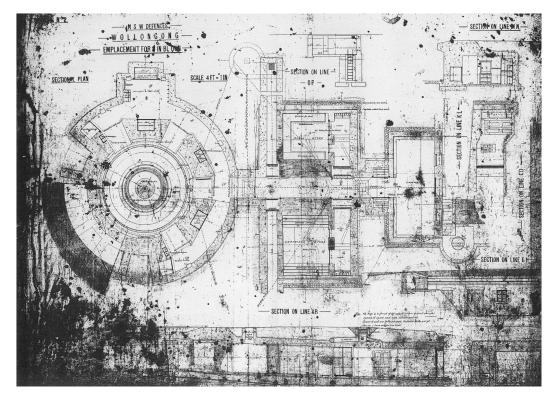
Flagstaff Hill Fort drawing showing the plan layout, elevation and sections, date unknown (Source: Wollongong City Libraries)
